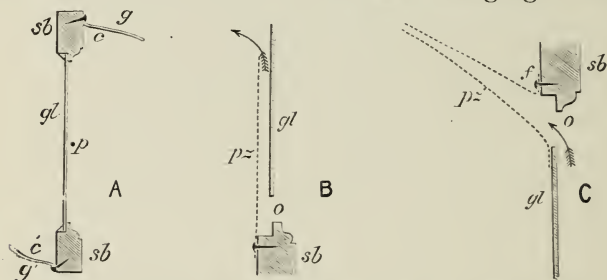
ARRANGEMENT OF WINDOWS IN OPERATING-ROOM. Sections.
